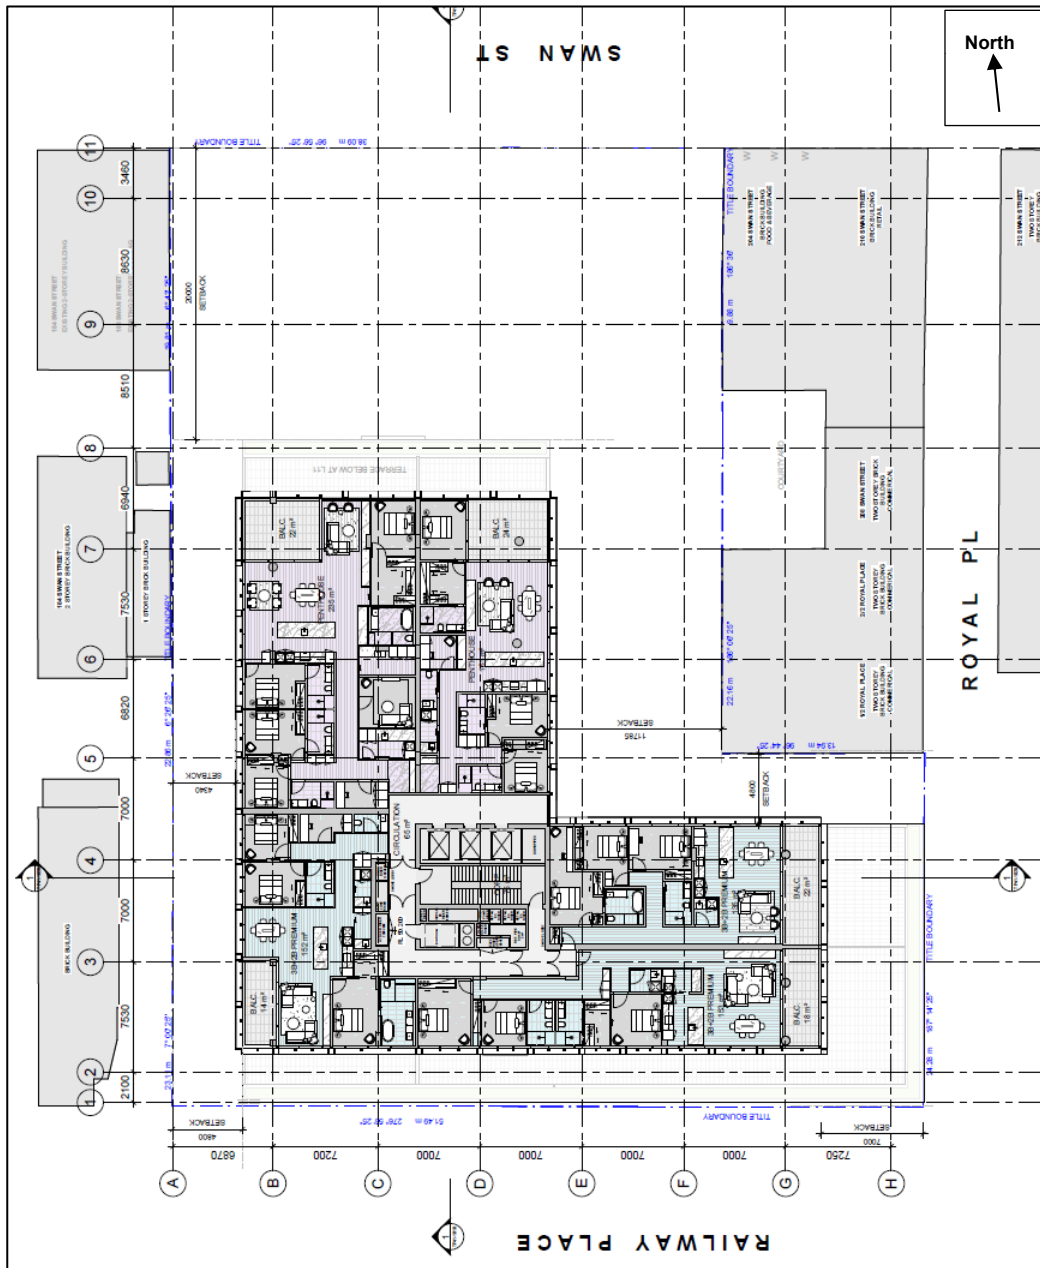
Level 12 floor plan of the proposed 188-202 Swan Street Development.
